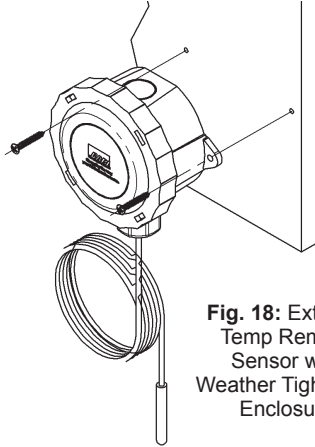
Extreme Temp Remote Sensor with Weather Tight (EU) Enclosure
